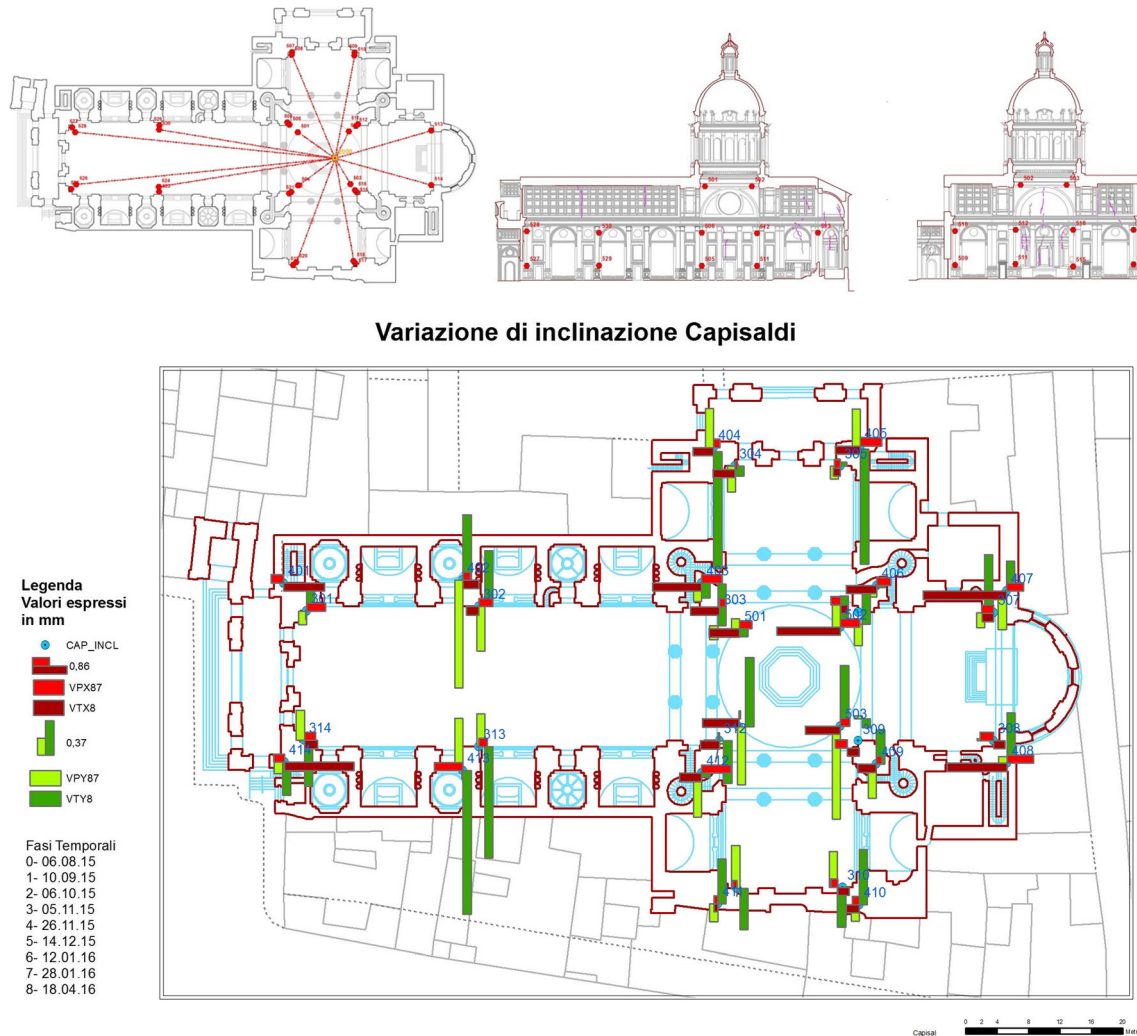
The positional scheme of the prisms in plan and elevation on the top
